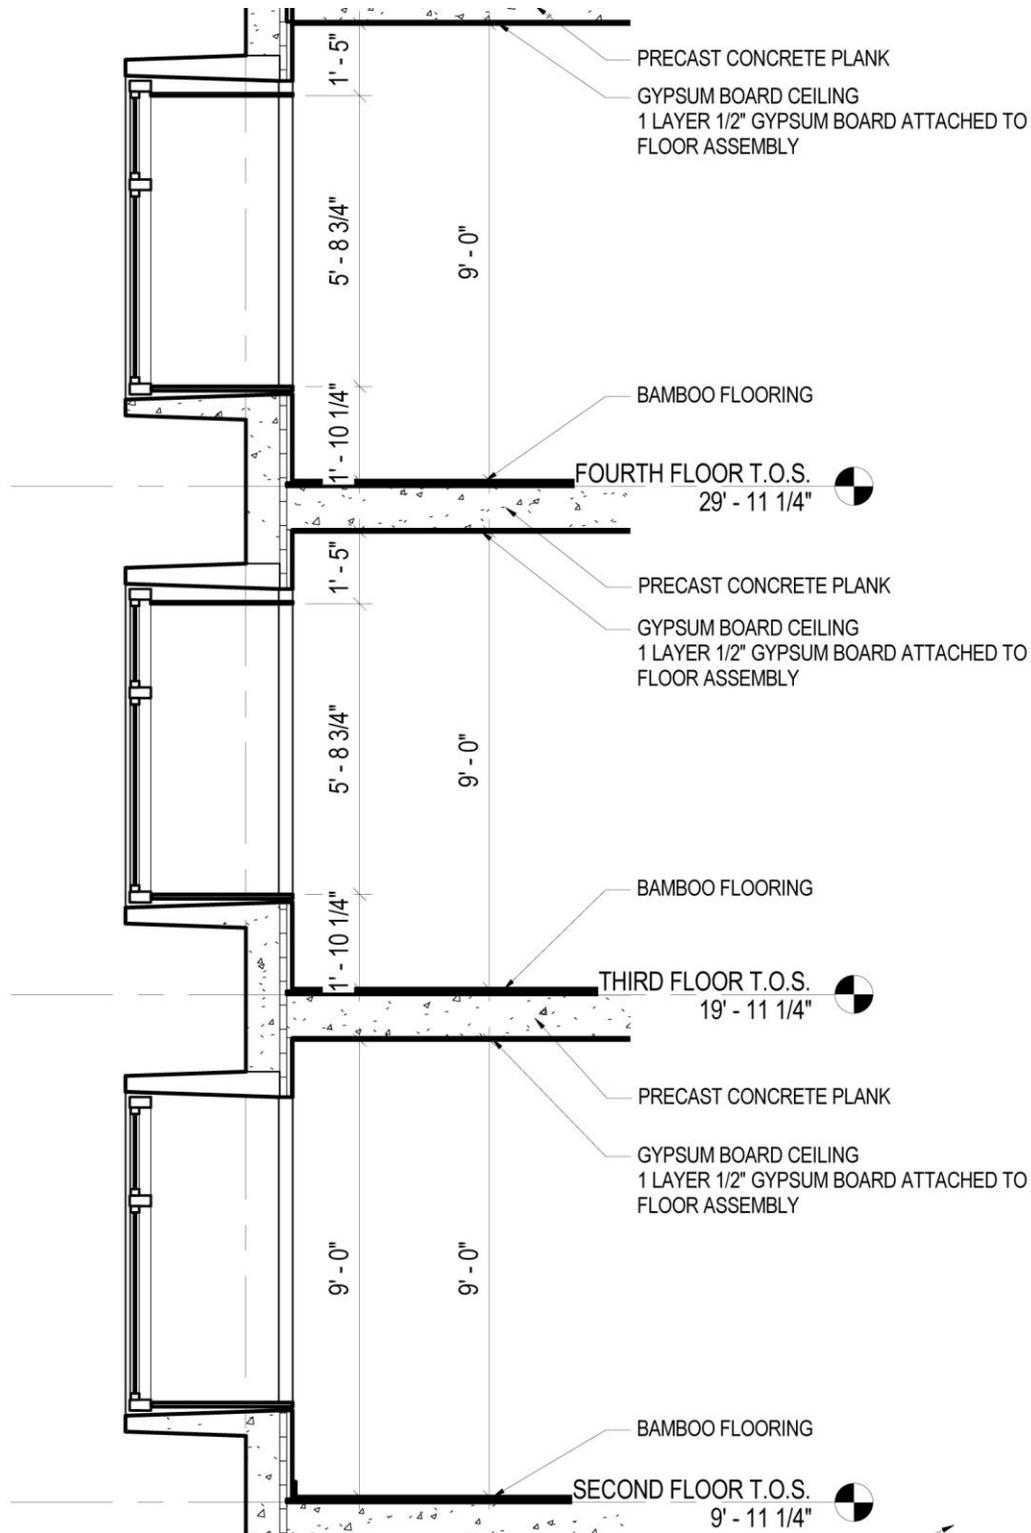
Shell walls use a studded precast cavity wall that connects to precast floor planks via welded steel plates. The cavity wall allows for additional insulation, which ultimately increases the energy performance of the building.
